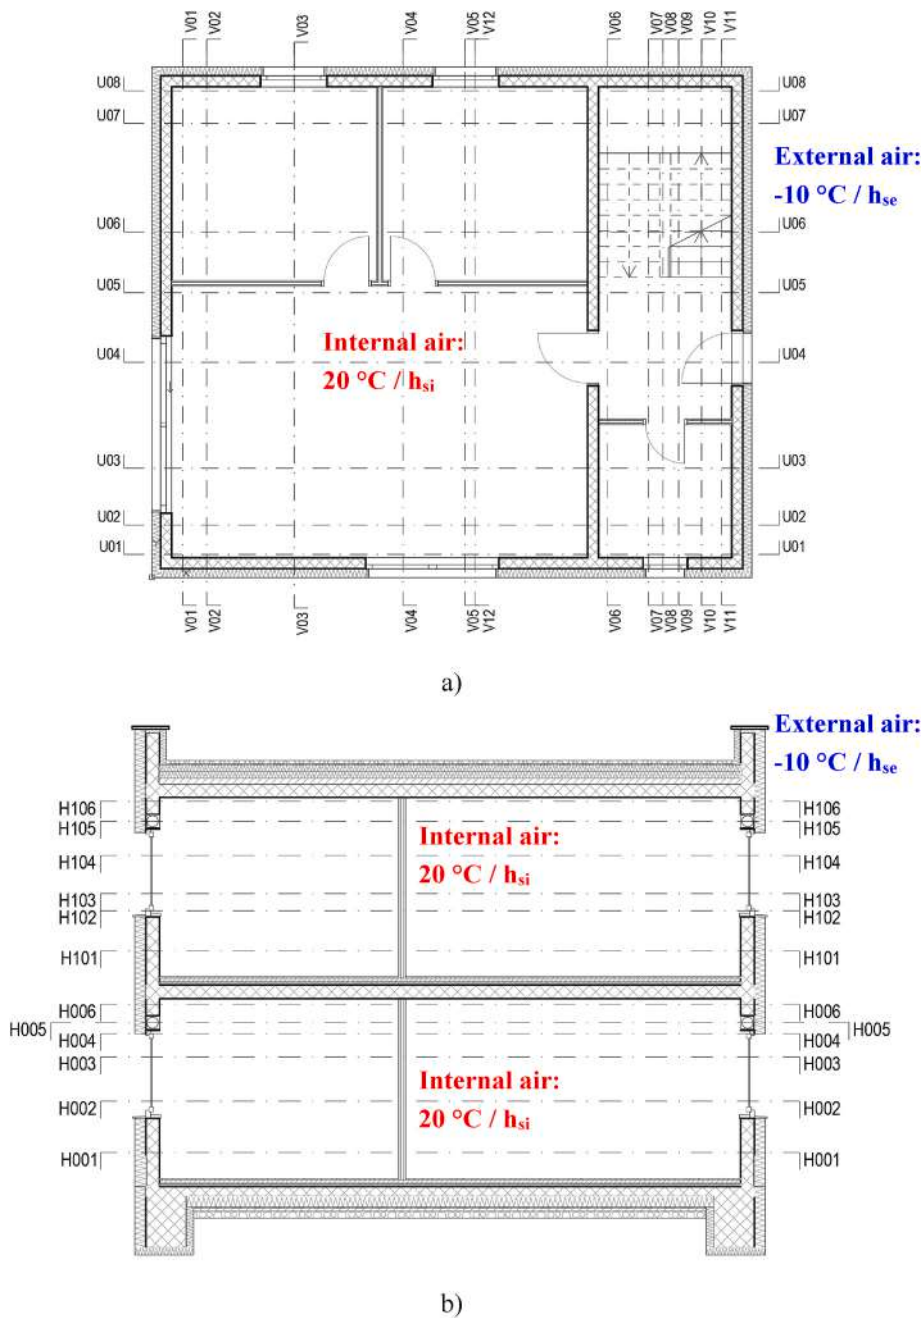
Multi-section building cross-section locations; a) vertical and b) horizontal.
